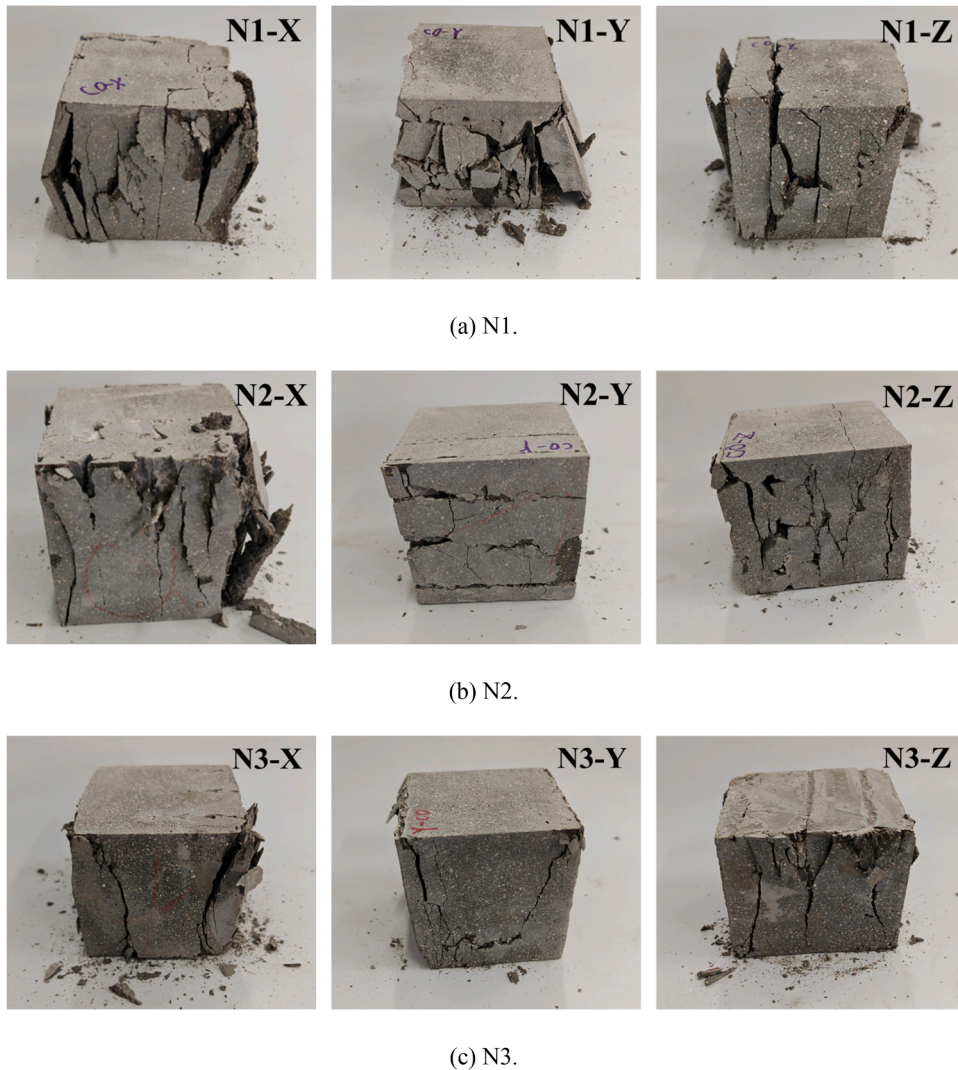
Failure mode of 3D printed specimens (compression test).
